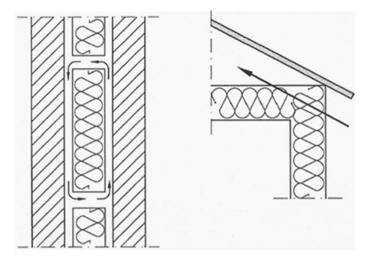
Convective thermal bridge in a cavity wall where the insulation does not fill the cavity completely and in a wall/roof joint where the wind can blow through part of the insulation. Arrows indicate air flows. (Source: Olsen and Johannesson 1996)
